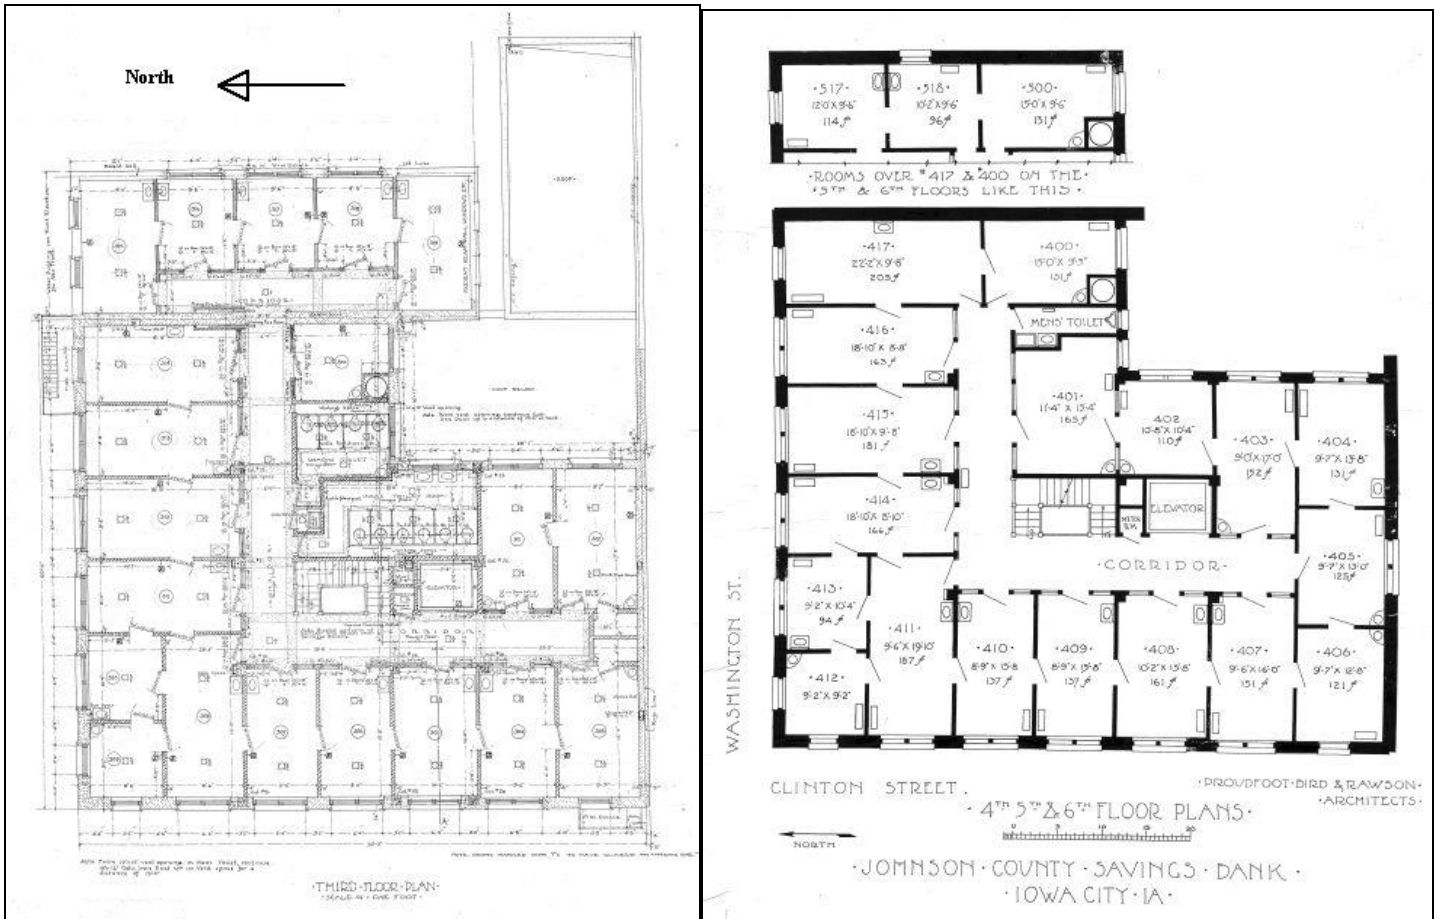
illustrate the original and current basic floor layouts with their intersecting north-south and east-west running halls, main stair location and their inclusion of the three-story east building on these two levels. Figure 8, showing the third floor actually shows a continuation of the standard office layout within the other part of the building. In each case, the north-south hallway continued eastward to egress those office areas. The elevator is located towards the east side of the south end of the south hall. The open stairwell occupies the corner of the hallway L. The east halls lead directly into the second and third floor levels of the adjacent three-story building to the east. Ceilings are plastered and trim work is stained and varnished. The hall trim work is extensive, consisting of door and flanking barrow light framing with a chair rail linkage at shoulder level. Floors are terrazzo with inset tile ornament and cast baseboards. Lighting consists of a centered LED light system that runs overhead throughout the halls. The original hall layout survives apart from the south hall on the sixth floor, which has been somewhat opened up. All fire escape access rooms are open office or work spaces, allowing emergency access. There is a single core staircase and an open wrap-around stair system. The stairway consists of metal balustrades with wood handrails. Stairs are also terrazzo with metal risers. A west stairway links the lower two floors and basement.
